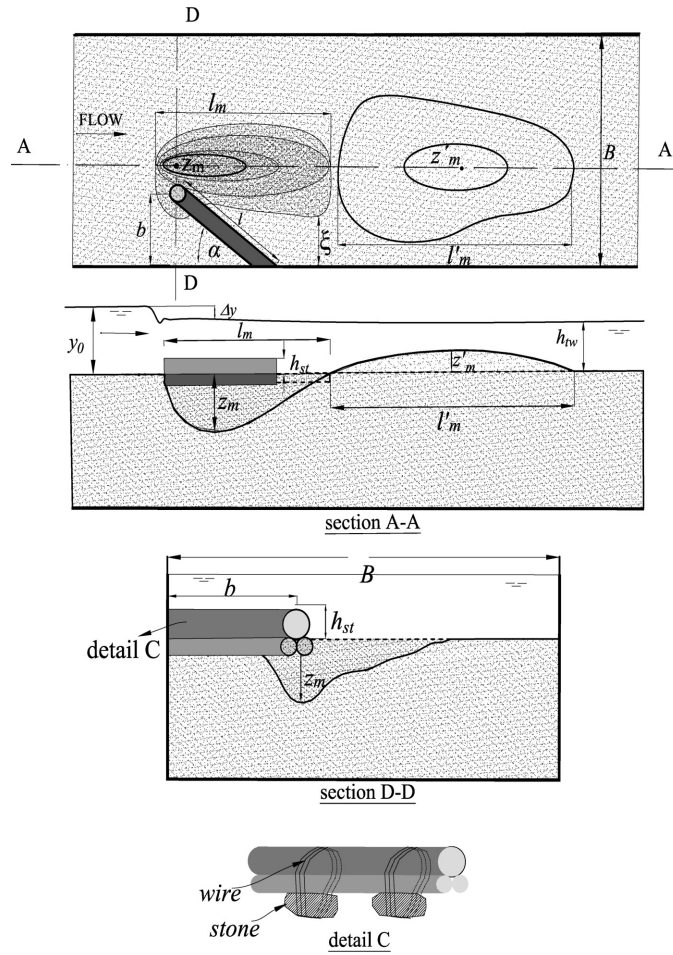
Plan, stream wise view A-A, cross section D-D with the main scour and flow parameters and the structure details (detail C).
